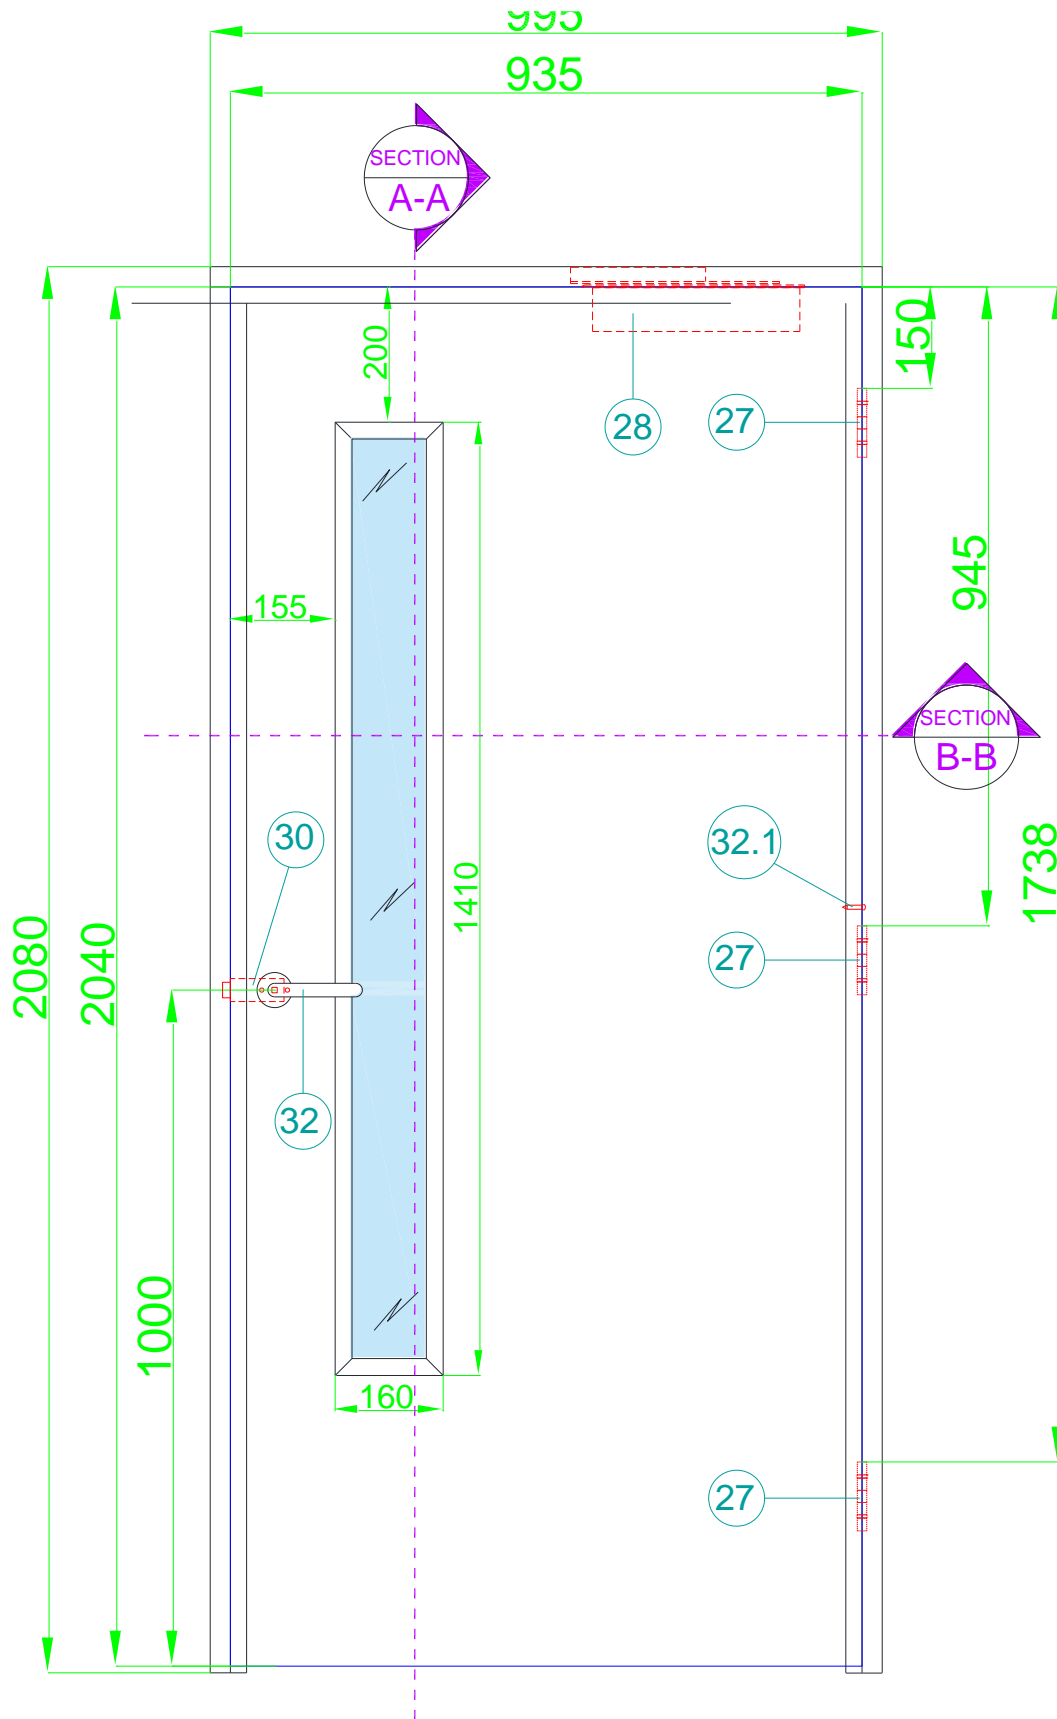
Doorset B - Elevation view of test specimen (unexposed side)
